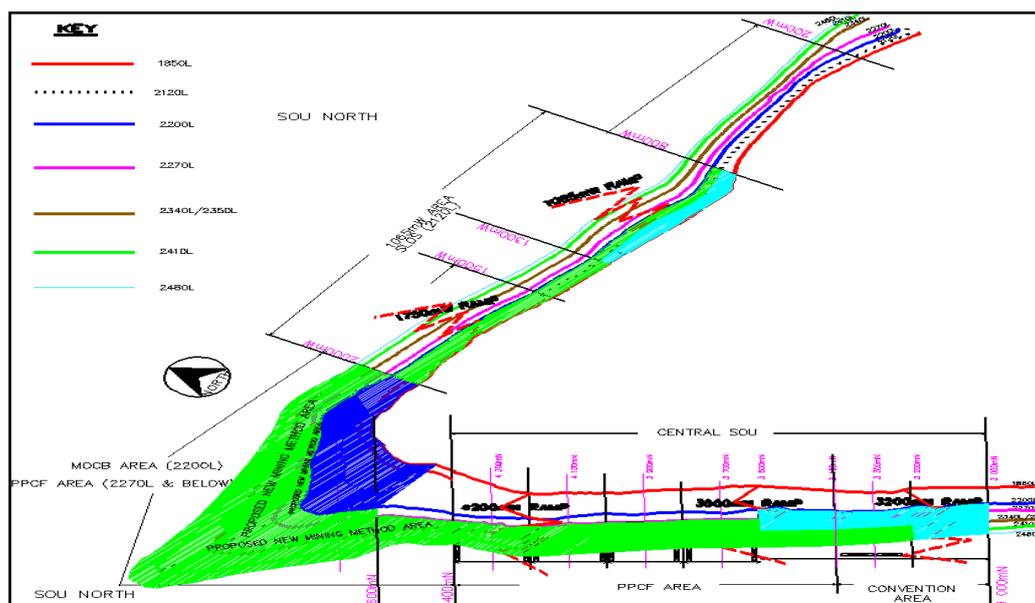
Konkola Mine, No.3 Shaft Underground plan view: ‘Nose’ area (KCM Expansion Projects)¹¹
